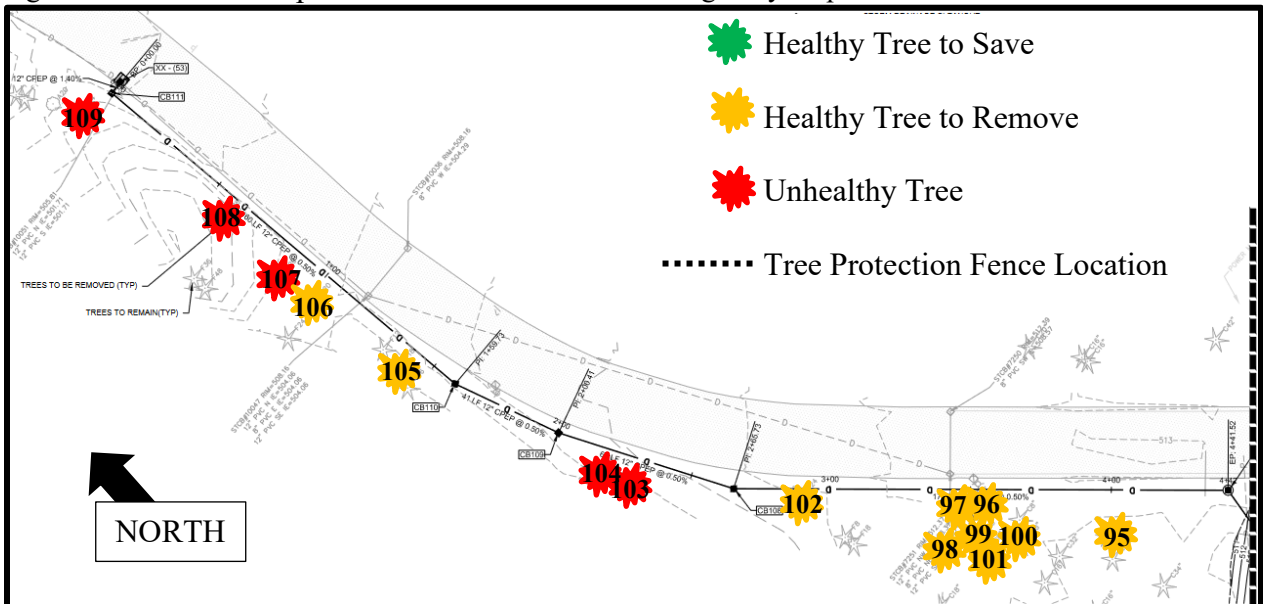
Continued site plan of site 3 on the Pierce College Puyallup Site.
